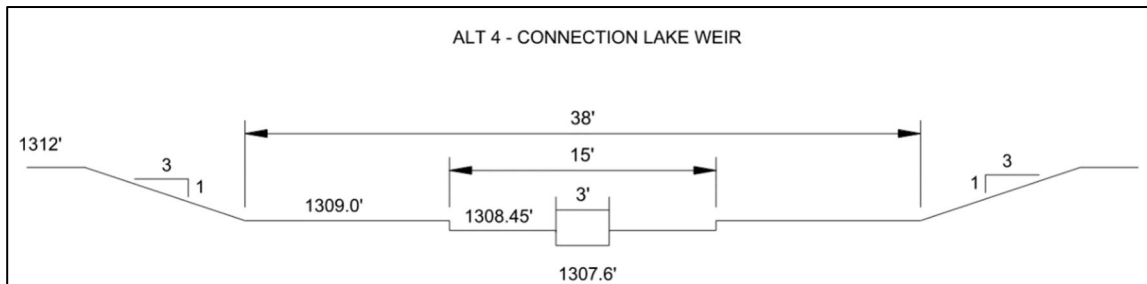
Alternative 4 Connection Lake Outlet Structure Layout
